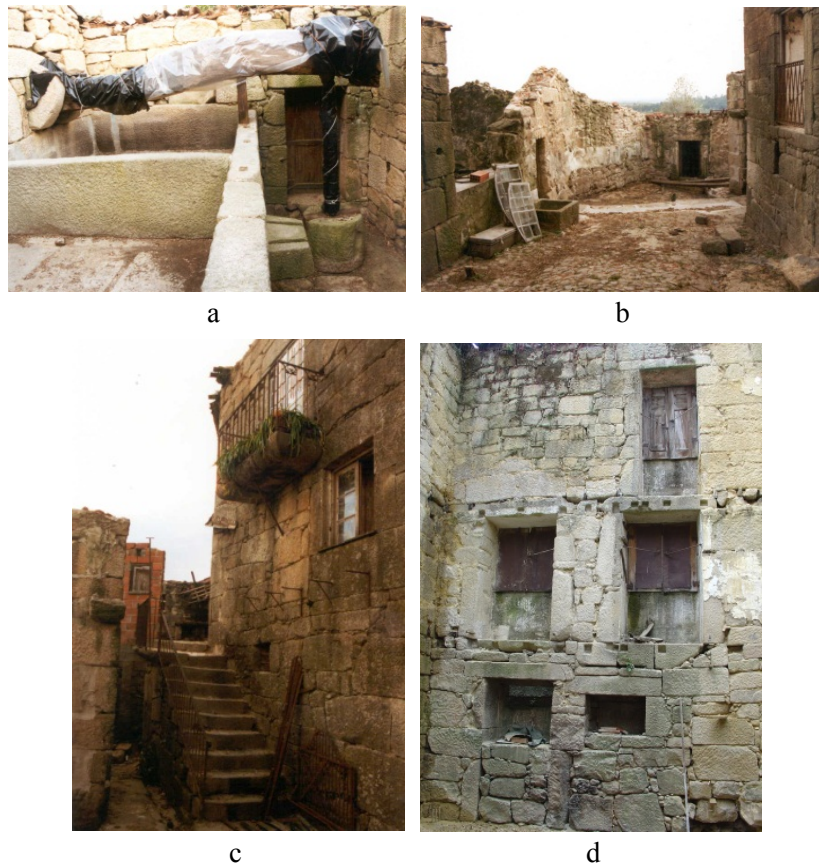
a) The existing mil; b) Annex buildings without architectonic interest; c) Posterior façade; d) Floors and roof structure supported by external walls (holes to fix floors wooden structure)
